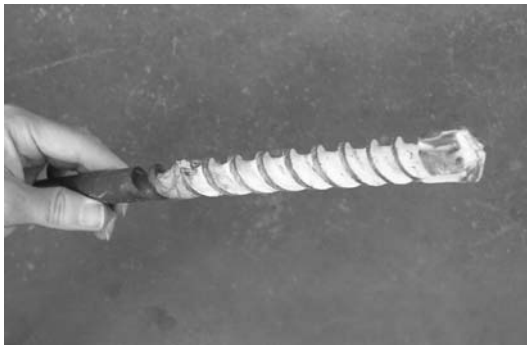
3/4-in. rotary hammer drill carbide-tipped bit
